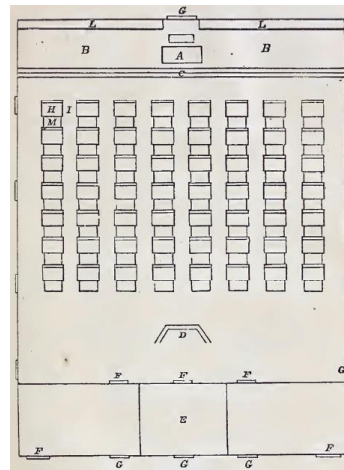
one-room schoolhouse plan recommended by Horace Mann [7]
